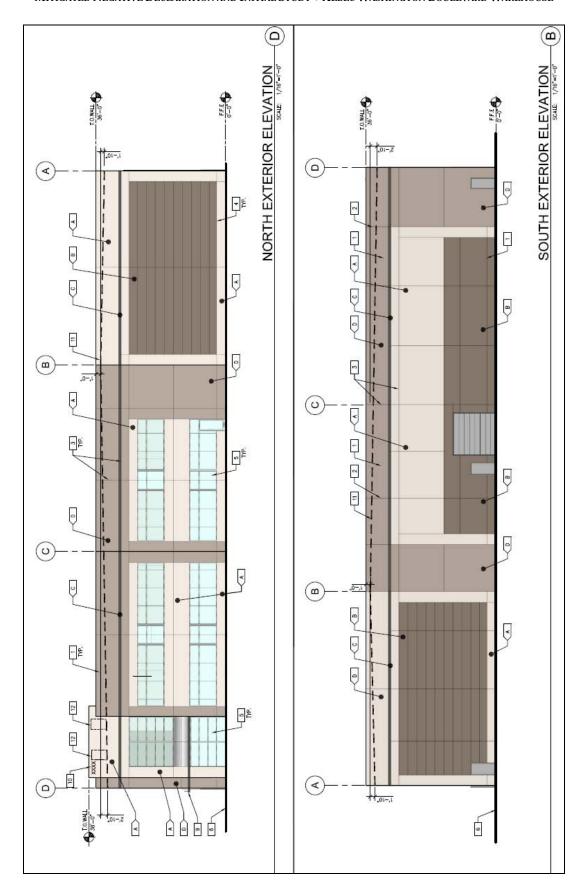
CONCEPTUAL BUILDING ELEVATIONS SOURCE: WARE MALCOMB
